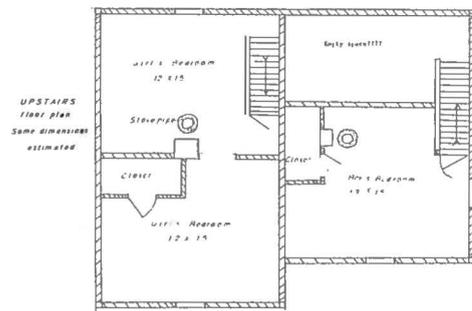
Christian and Hansine Norgaard house. Floor plan, second floor. Drawn by Herluf Ries.
